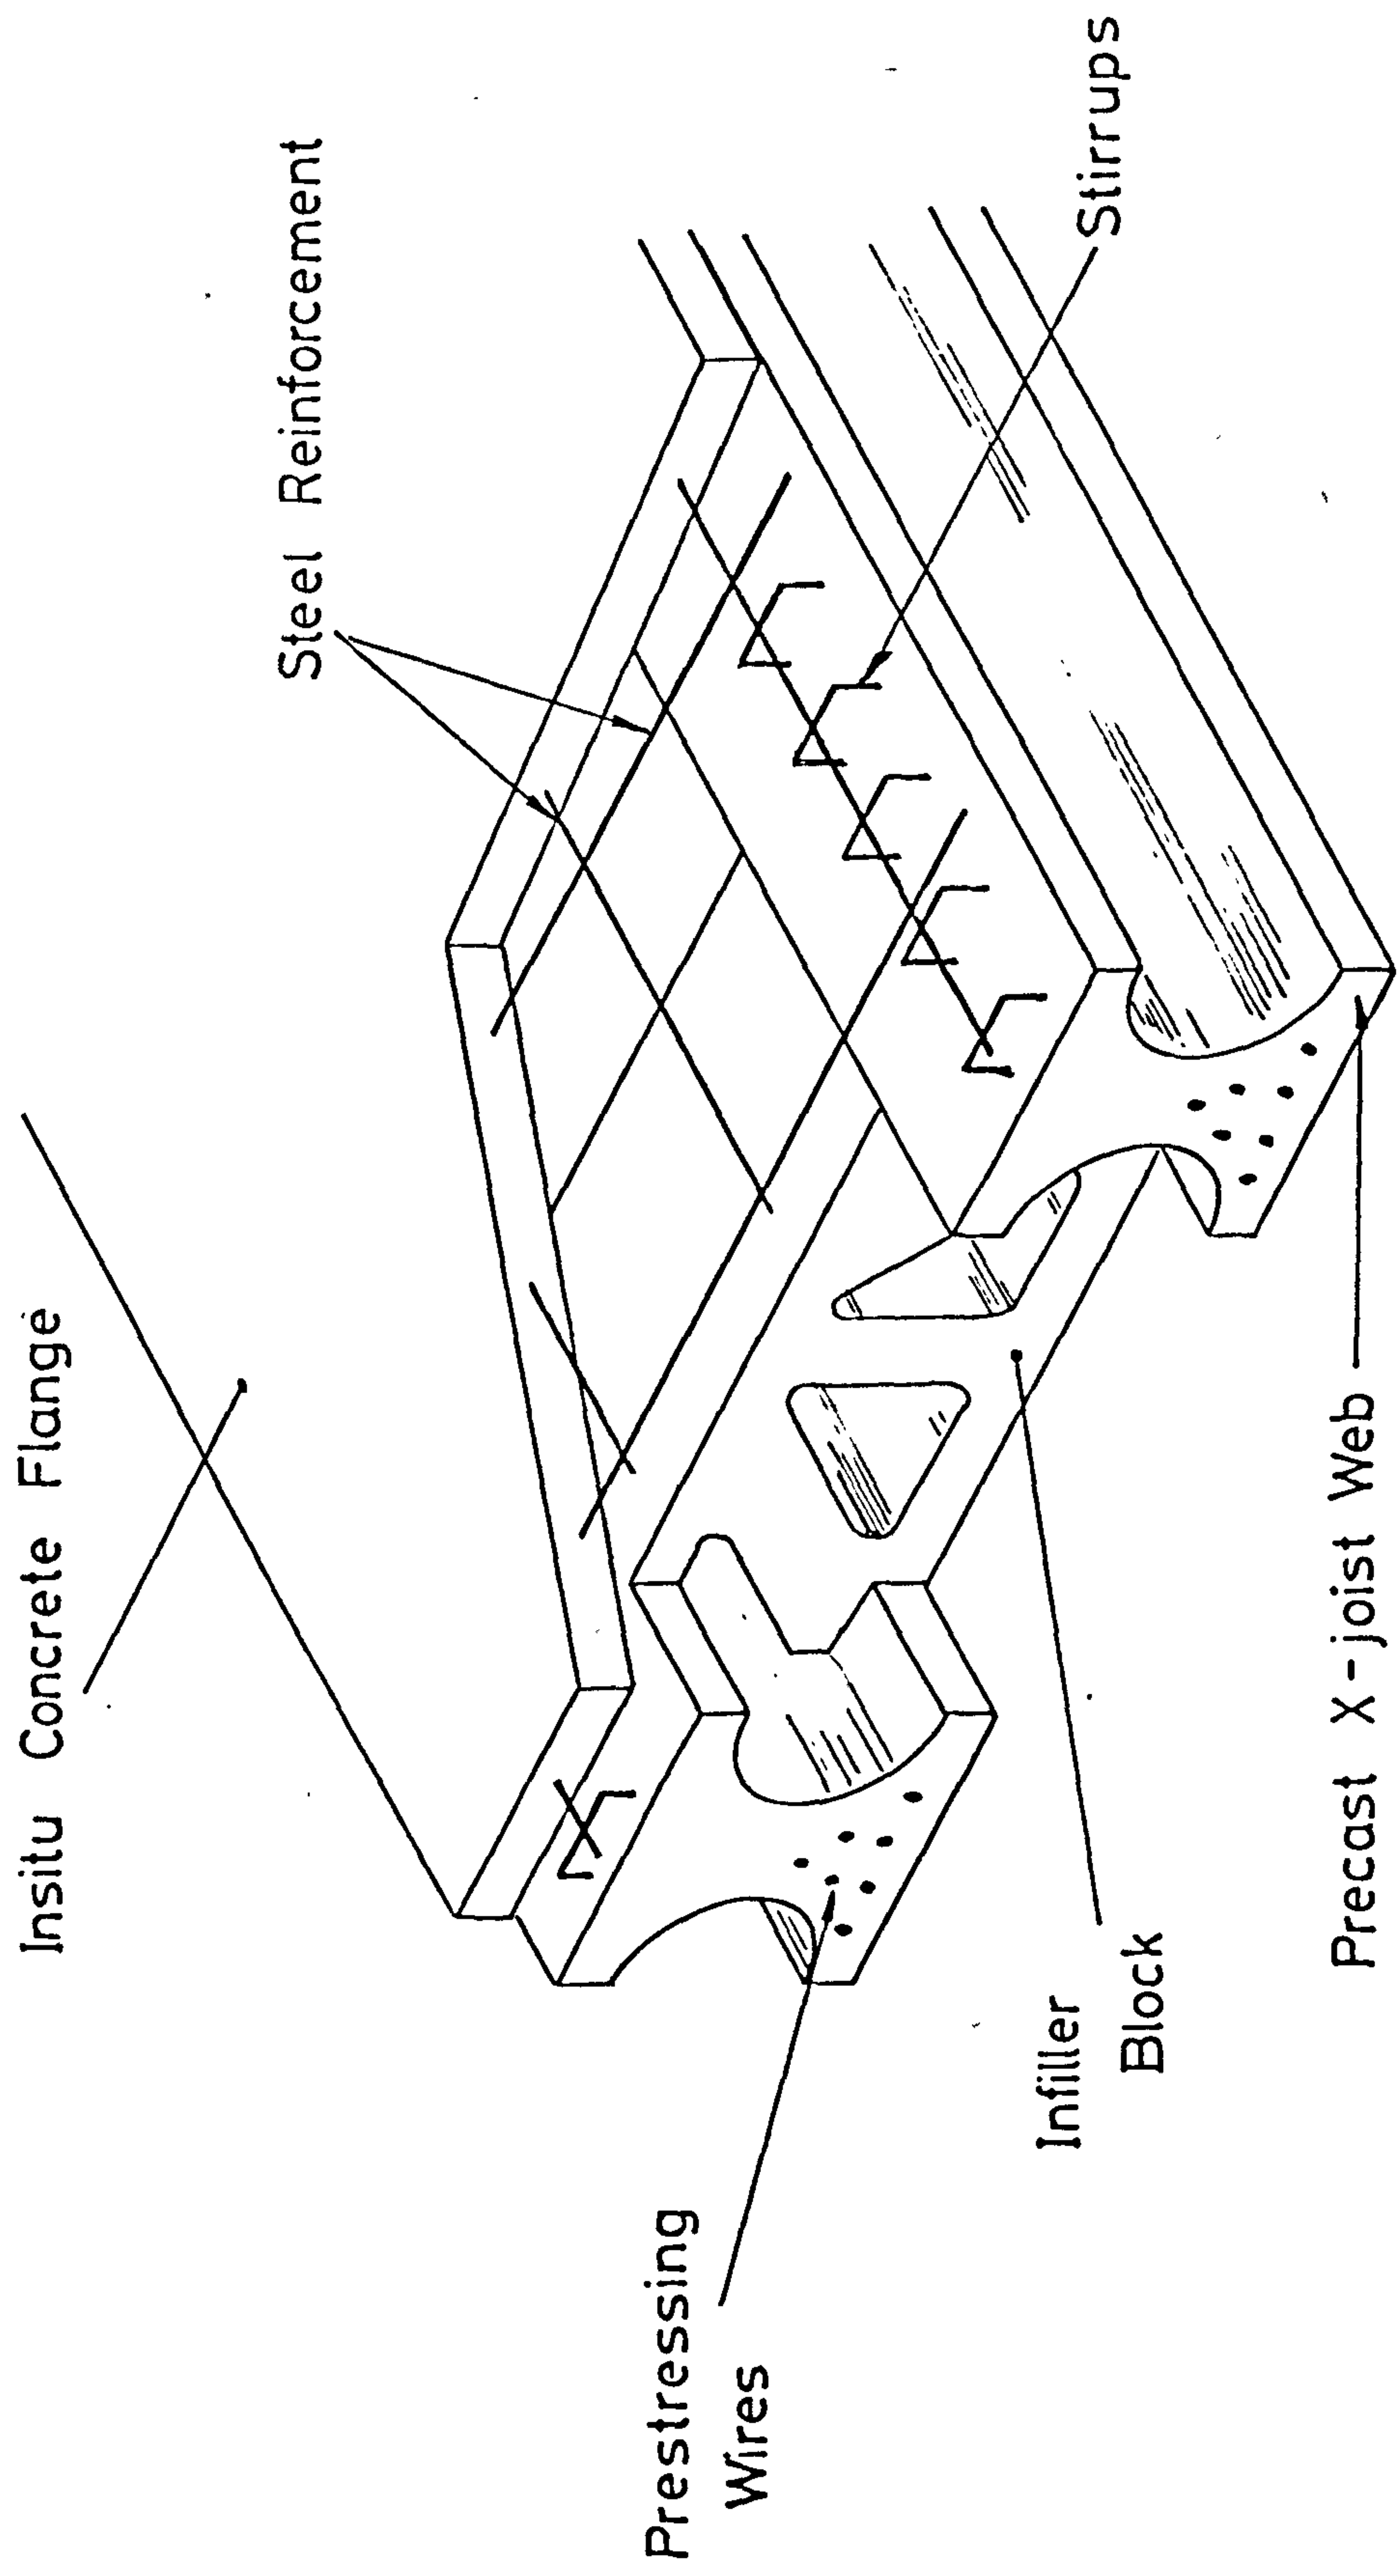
COMPOSITE FLOOR CONSTRUCTION
